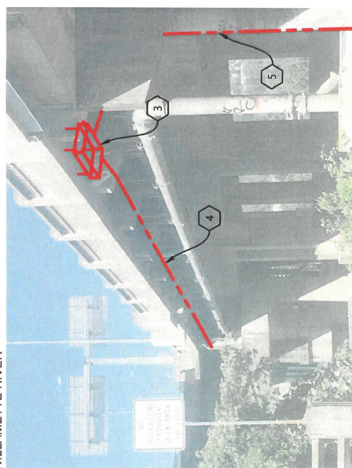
FACING WEST ON SOUTH SIDE OF BRIDGE, EAST SIDE OF WILLAMETTE RIVER
